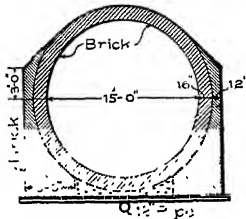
Circular Brick Sewer with Sub-drain, 64th Street Brooklyn, N. Y.
